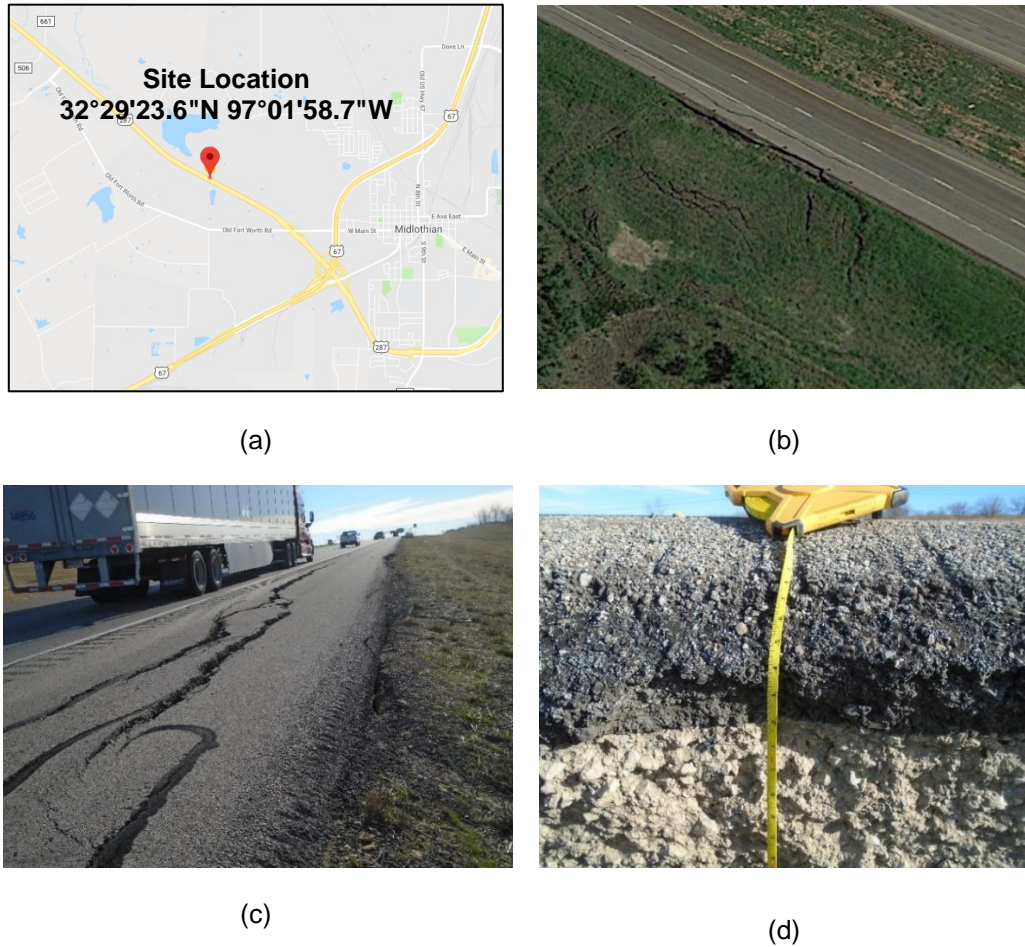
(a) Site location, (b) Shallow slope failure, (c) Shoulder cracks, and (d) Maximum edge drop of 20 inches at the middle of the failure section (US Highway 287).
